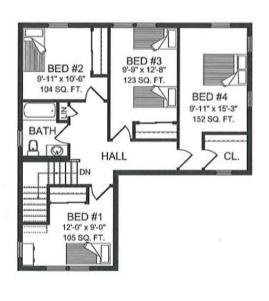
IMAGE MAY NOT REFLECT ACTUAL CONSTRUCTED HOUSE
